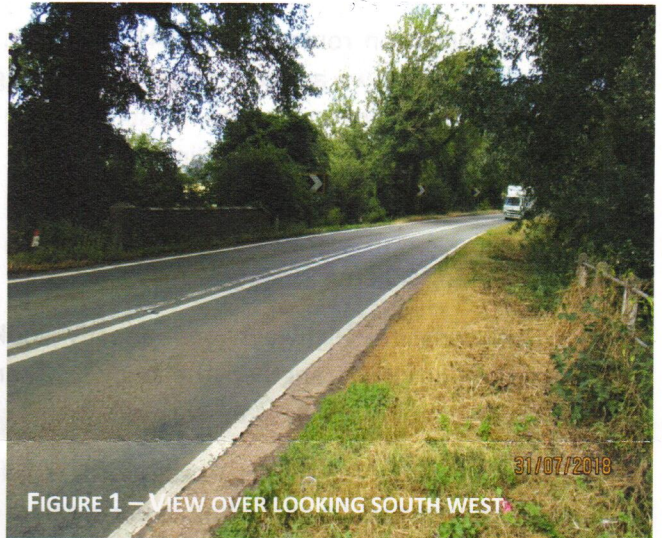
VIEW OVER LOOKING SOUTH WEST
